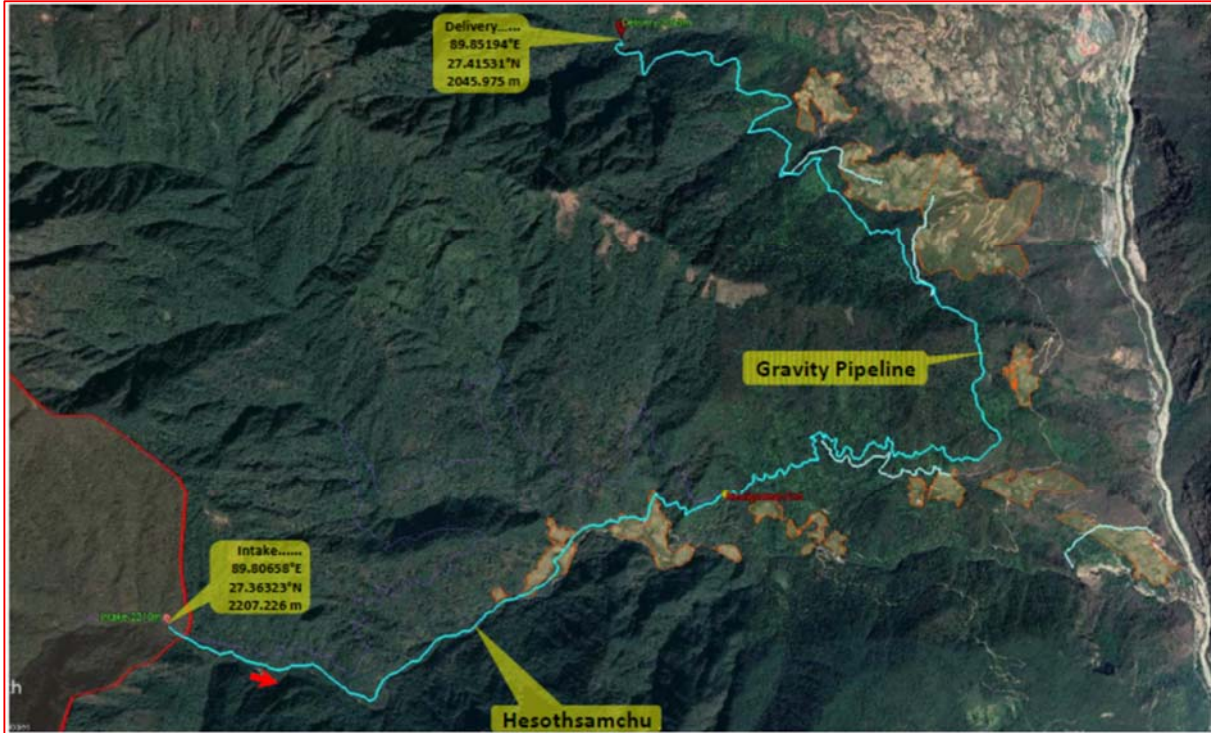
Pipeline Alignment Plan Main Transmission Line 0.00 - 21.09km (Source: Hydraulic Structure Design Report, August 2025)
